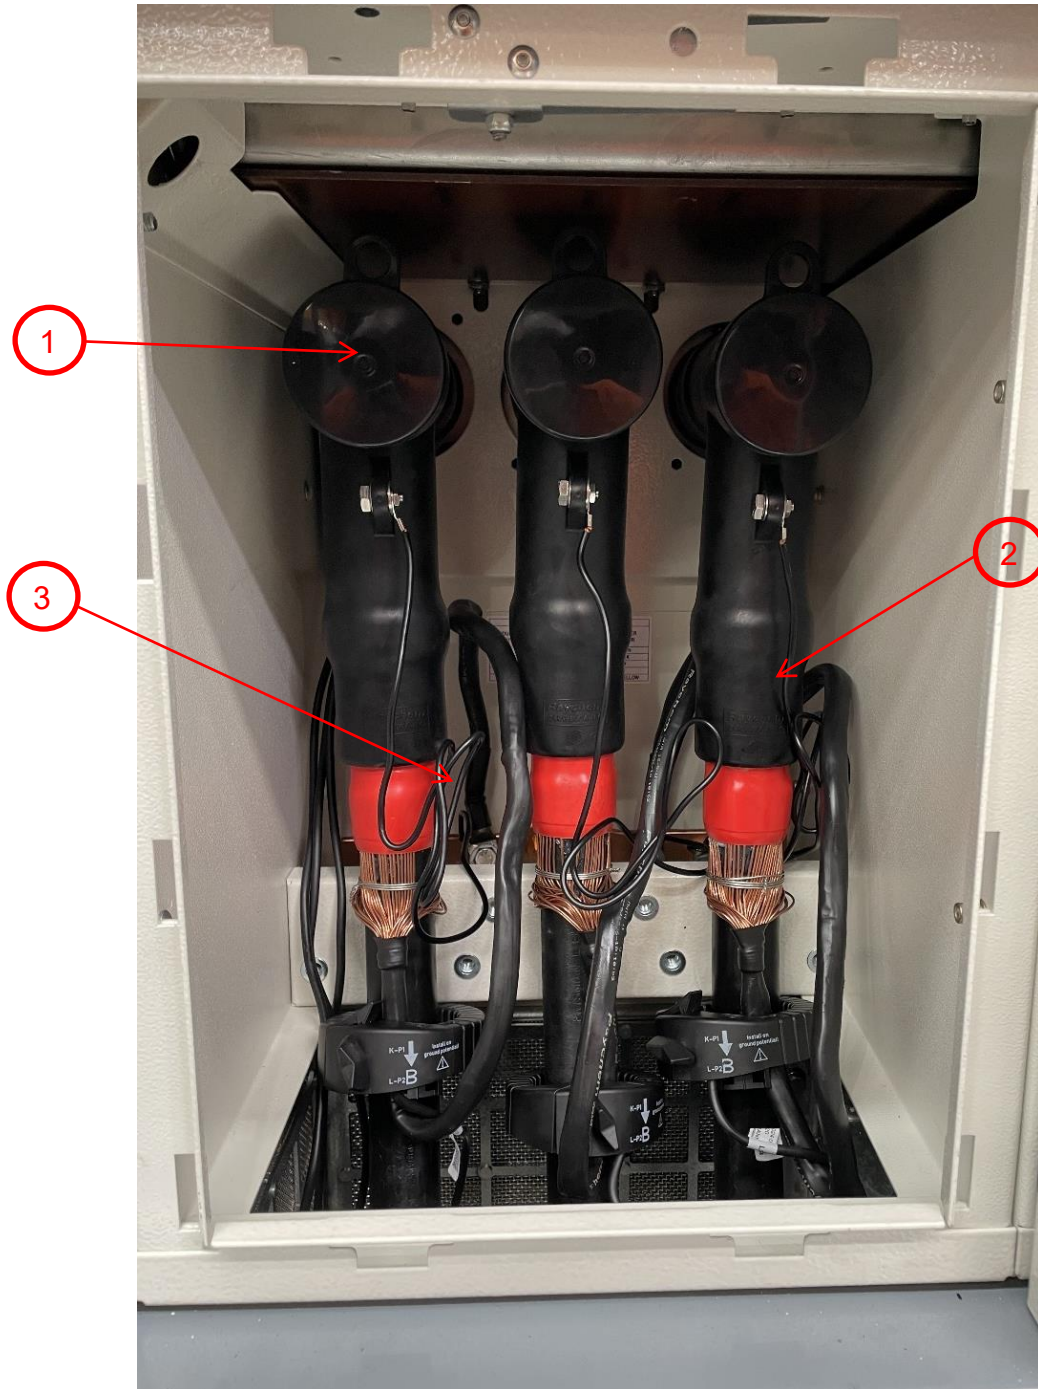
Indoor Feeder Cable Termination (front view)
